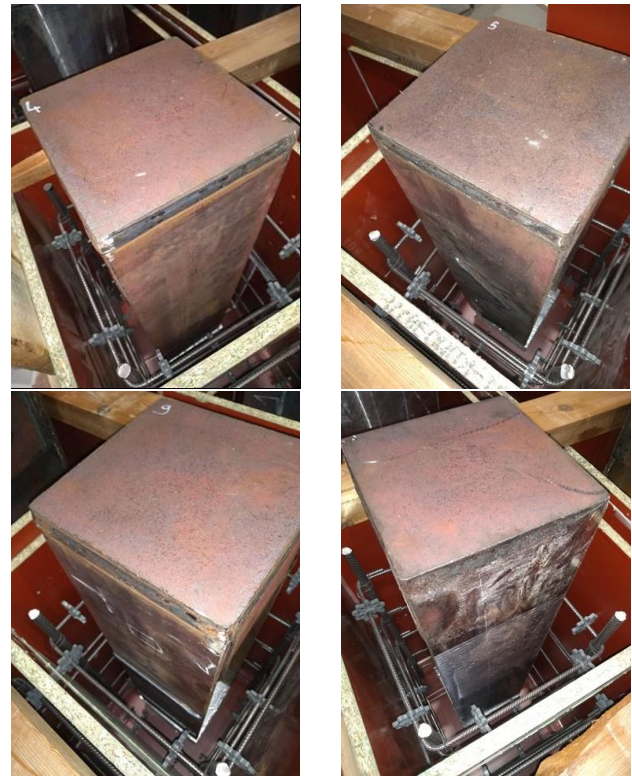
Test specimen surfaces: a) normal surface finishing, b) V-shaped ribs, c) I-shaped ribs, and d) ribbed surface.
